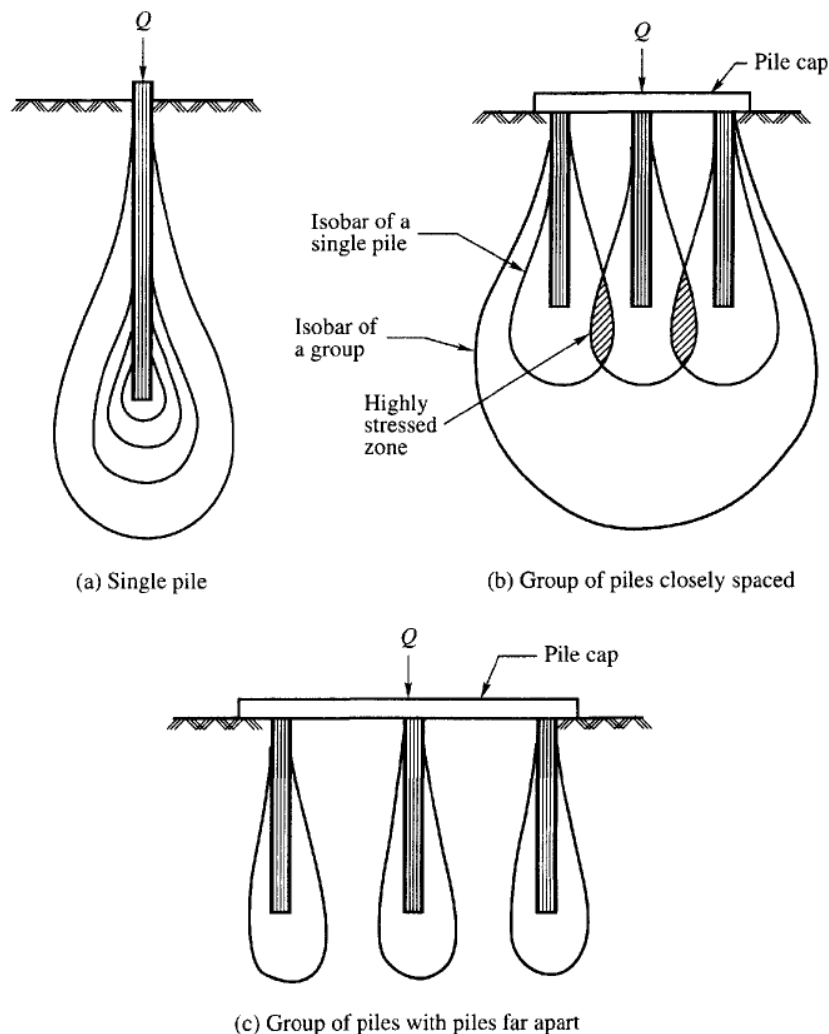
3. Pressure isobars of (a) single pile, (b) group of piles, closely spaced, and (c) group of piles with piles far apart.
